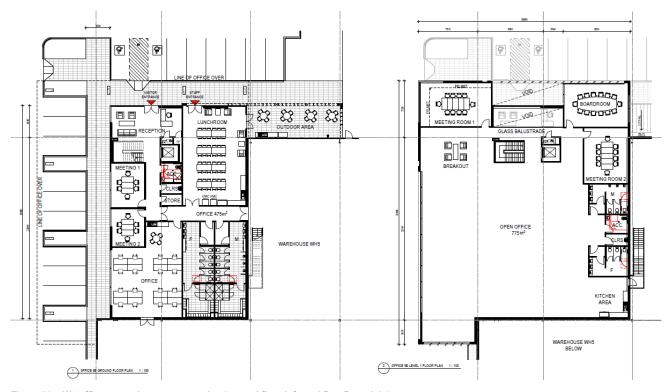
W5 office general arrangement plan (ground floor left, and first floor right)
